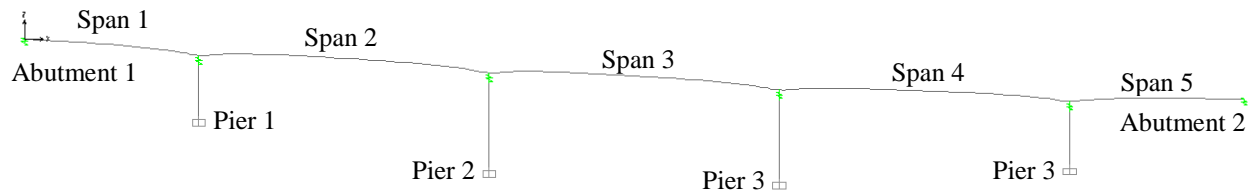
Smart Road Bridge Beamline Model – Elevation View
